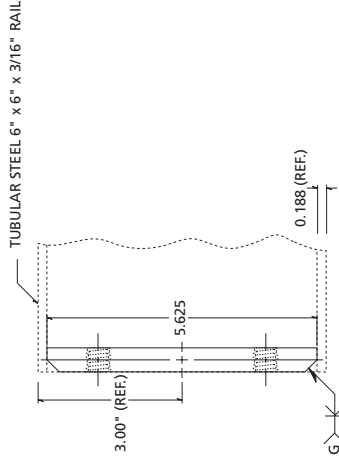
" x 6" STEEL RAIL PLUG PLAN VIEW
